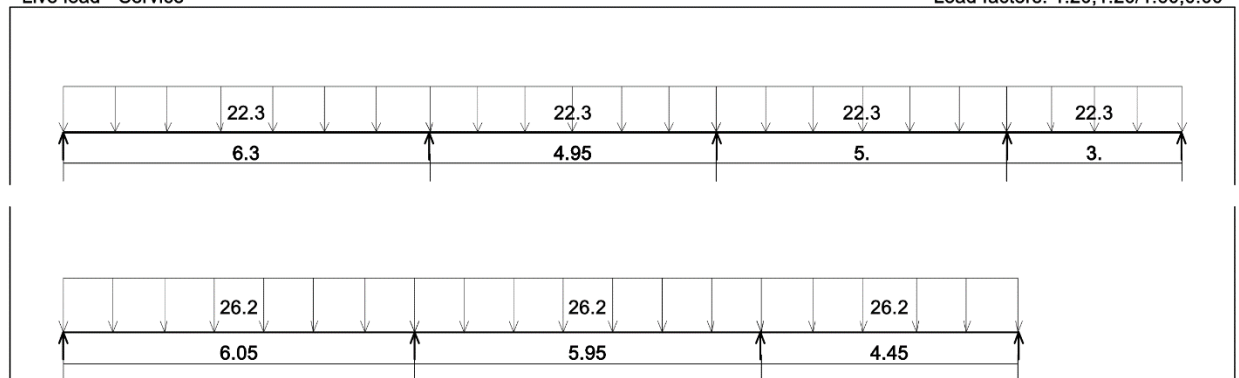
Statically System and Loads Distribution of Beam (B 10).
